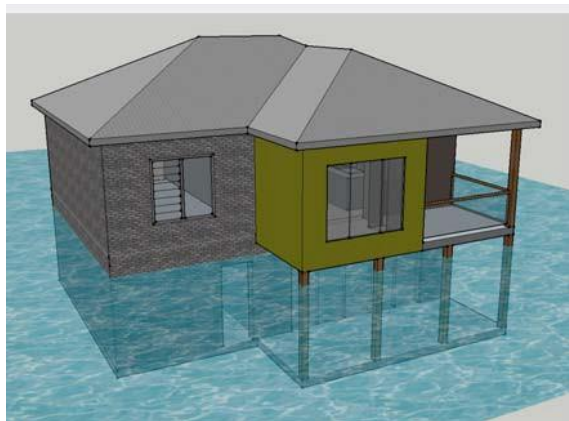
Typical elevations of building with non-habitable floor space below the FPL.
